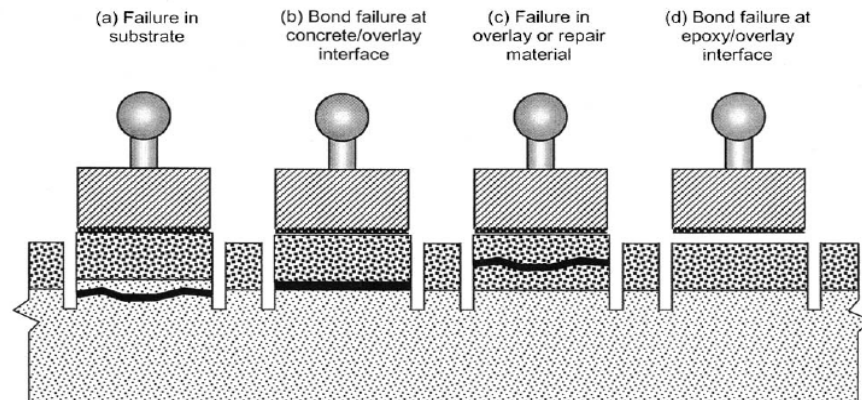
Pull-off test failure modes (ASTM C 1583, 2007)
